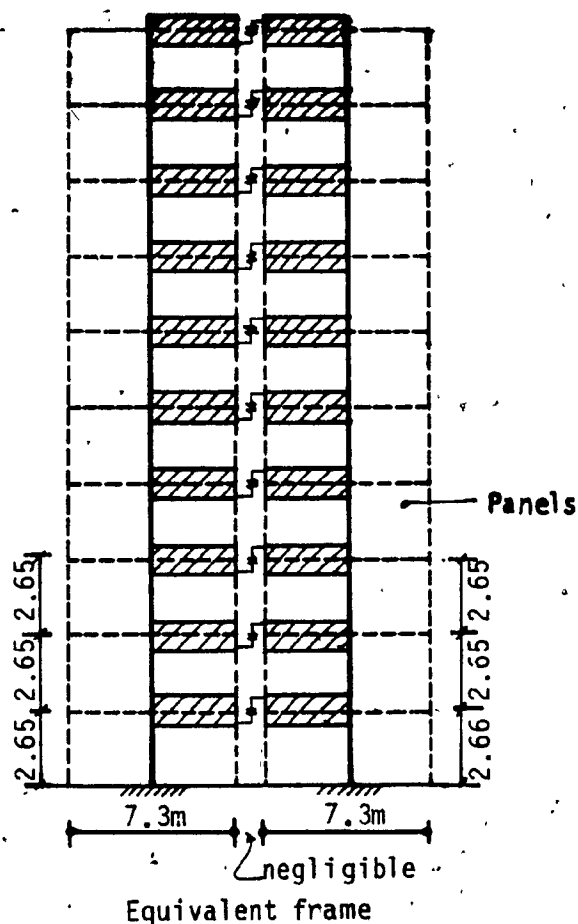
TYPICAL PANELIZED APARTMENT BUILDING
